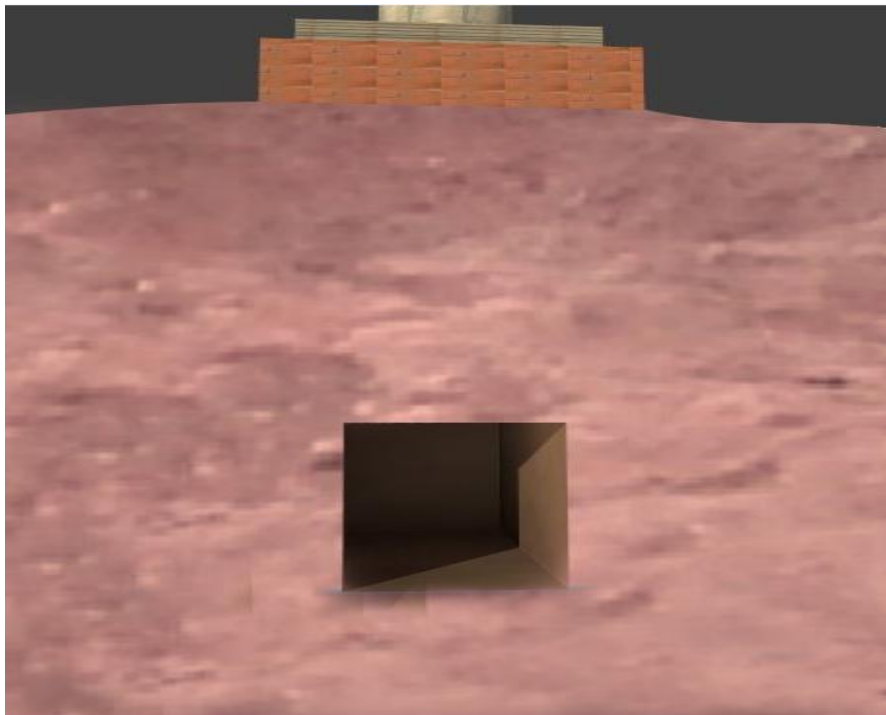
Section view of the underground tunnel at Bete-Amanueal (ARCHICAD drawing)
